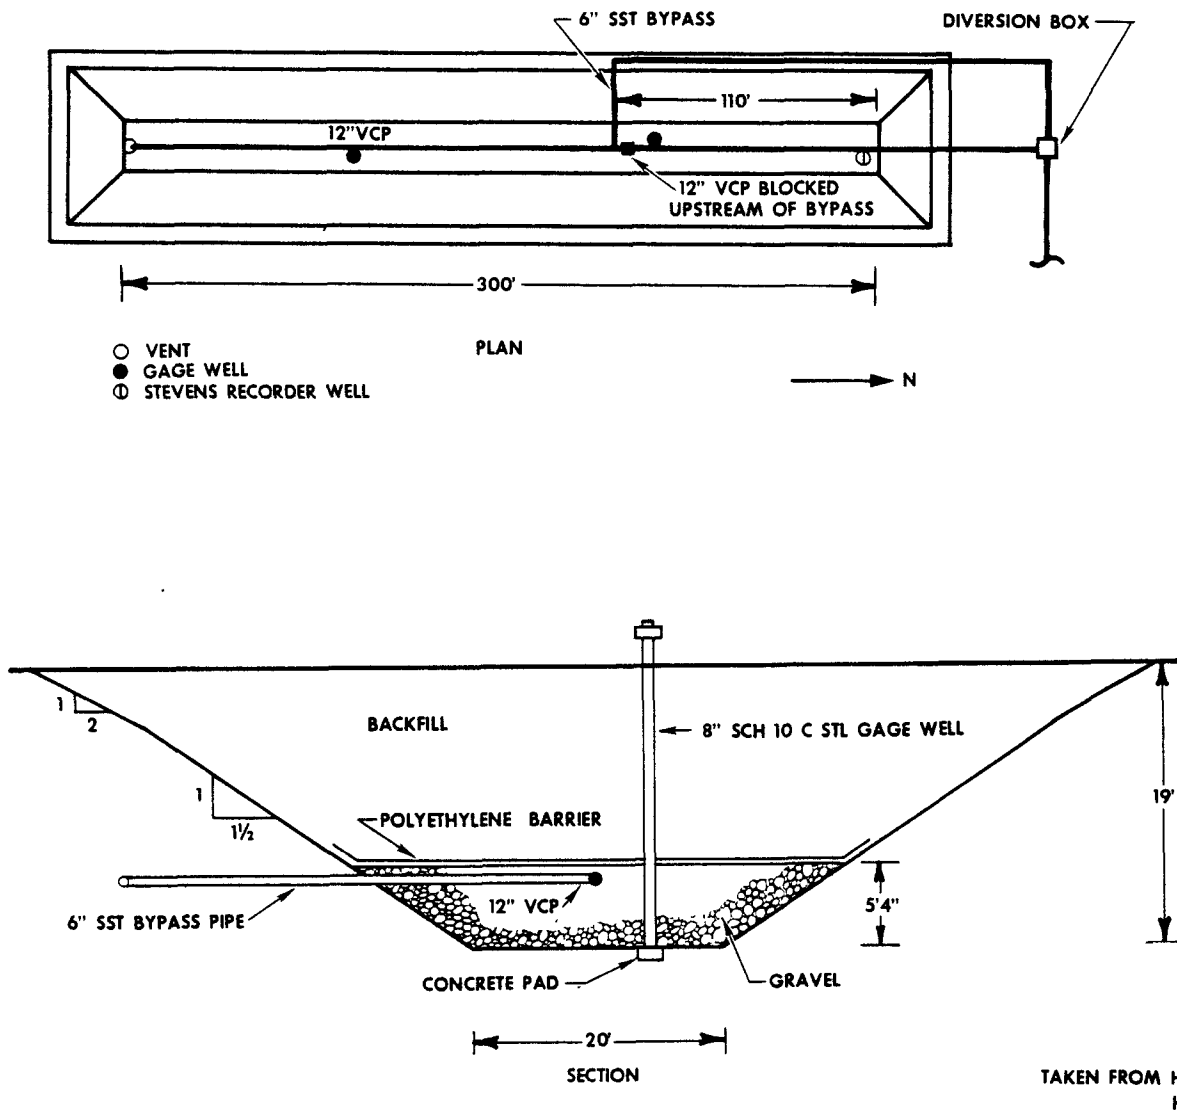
216-Z-12 Crib Plan and Cross Section. (14)
